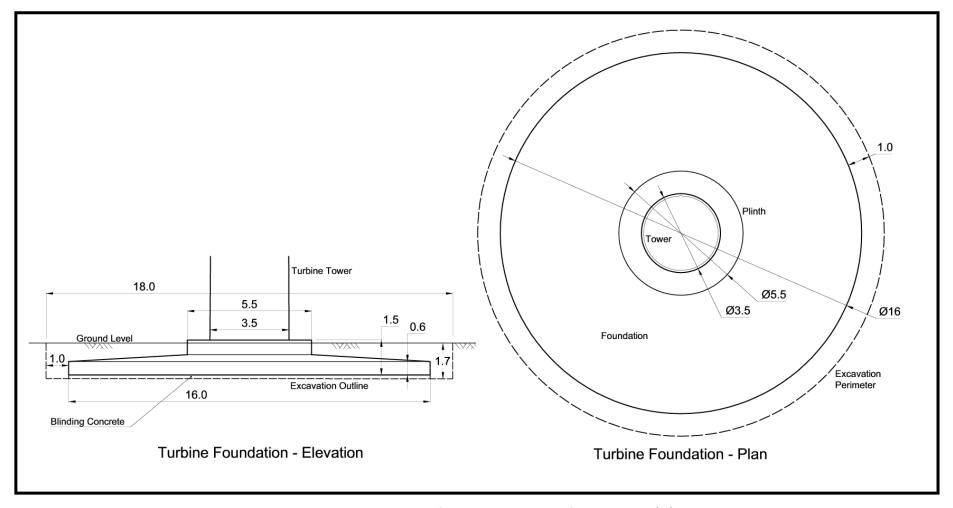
Typical buoyant foundation dimensions for E48 turbine (m)
